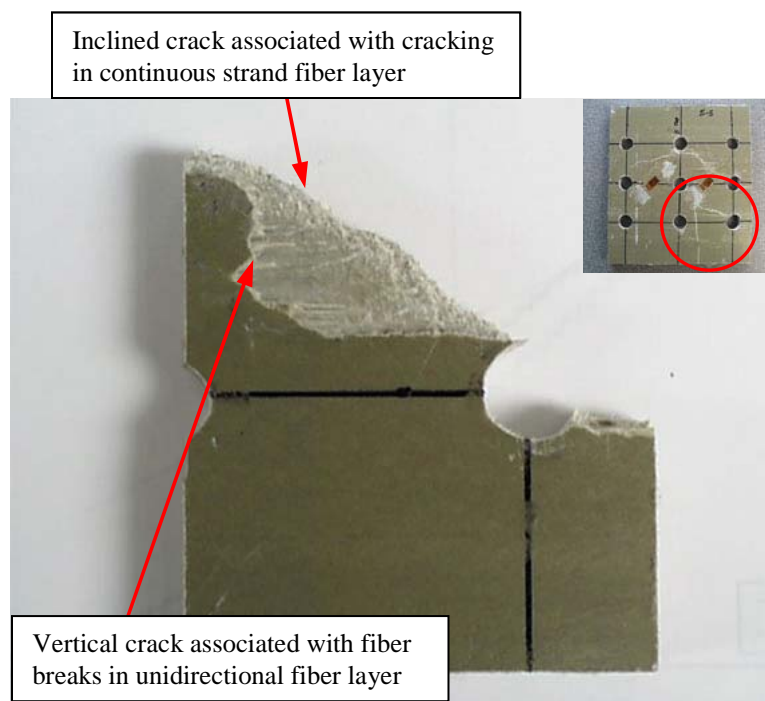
Autopsy of specimen SHEAR3 Showing Interior Inclined Crack and Exterior Vertical and Horizontal Crack
